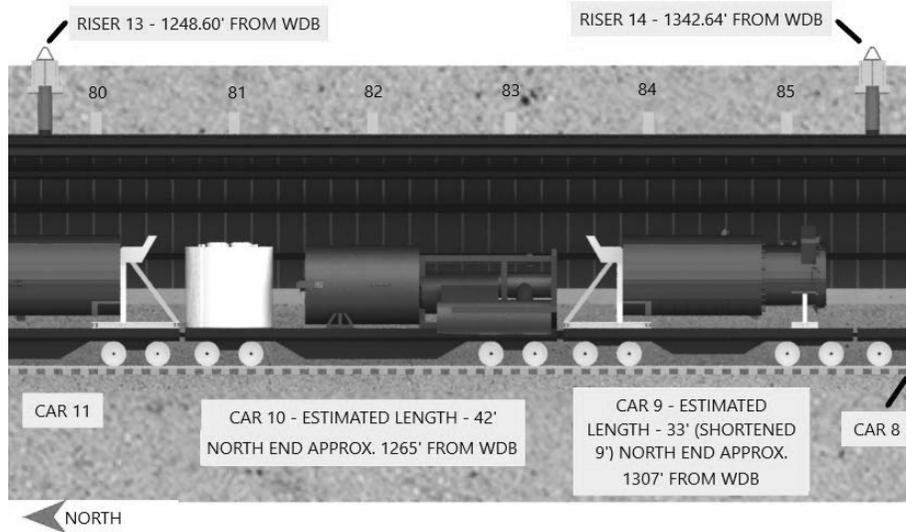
Riser 13 to Riser 14 Tunnel Section.
